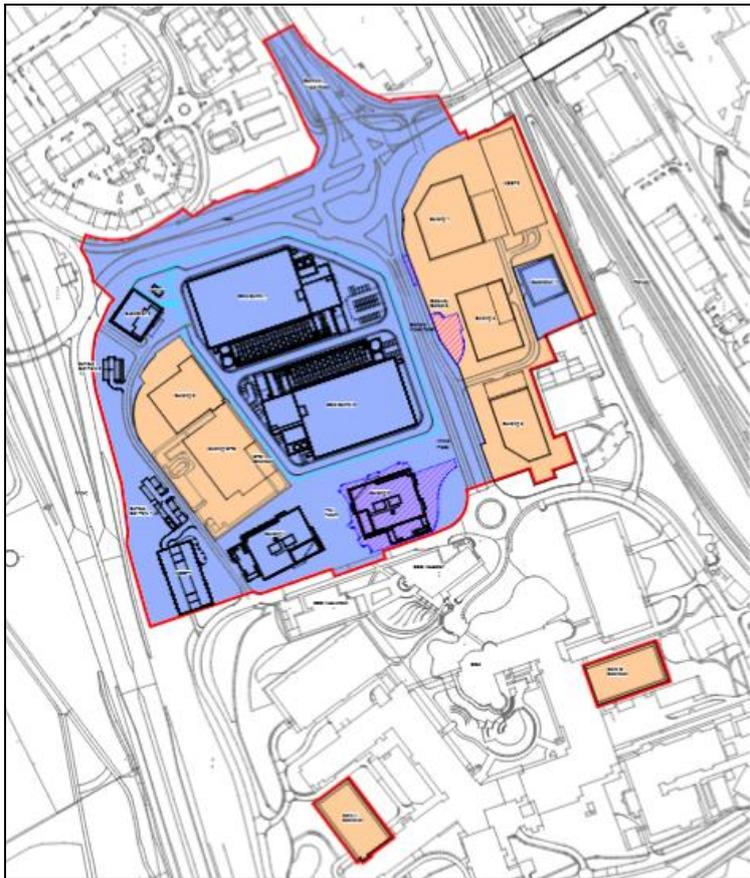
Detail and Outline Boundary Plan (purple zone is detailed)
